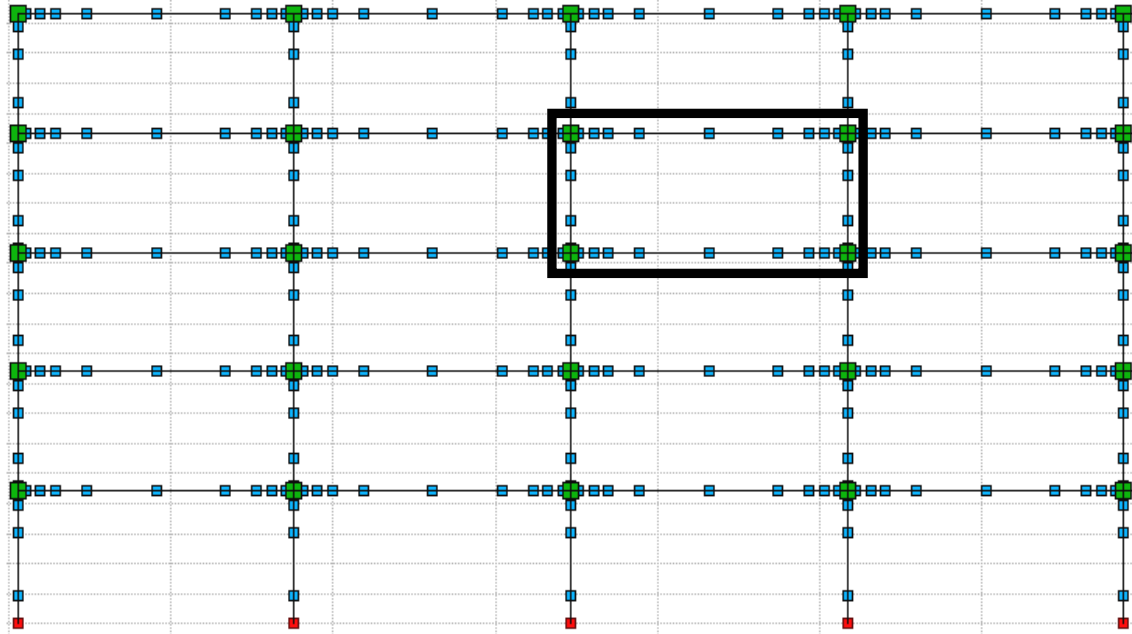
Modeling of case study building in ZEUS-NL – typical frame geometry
